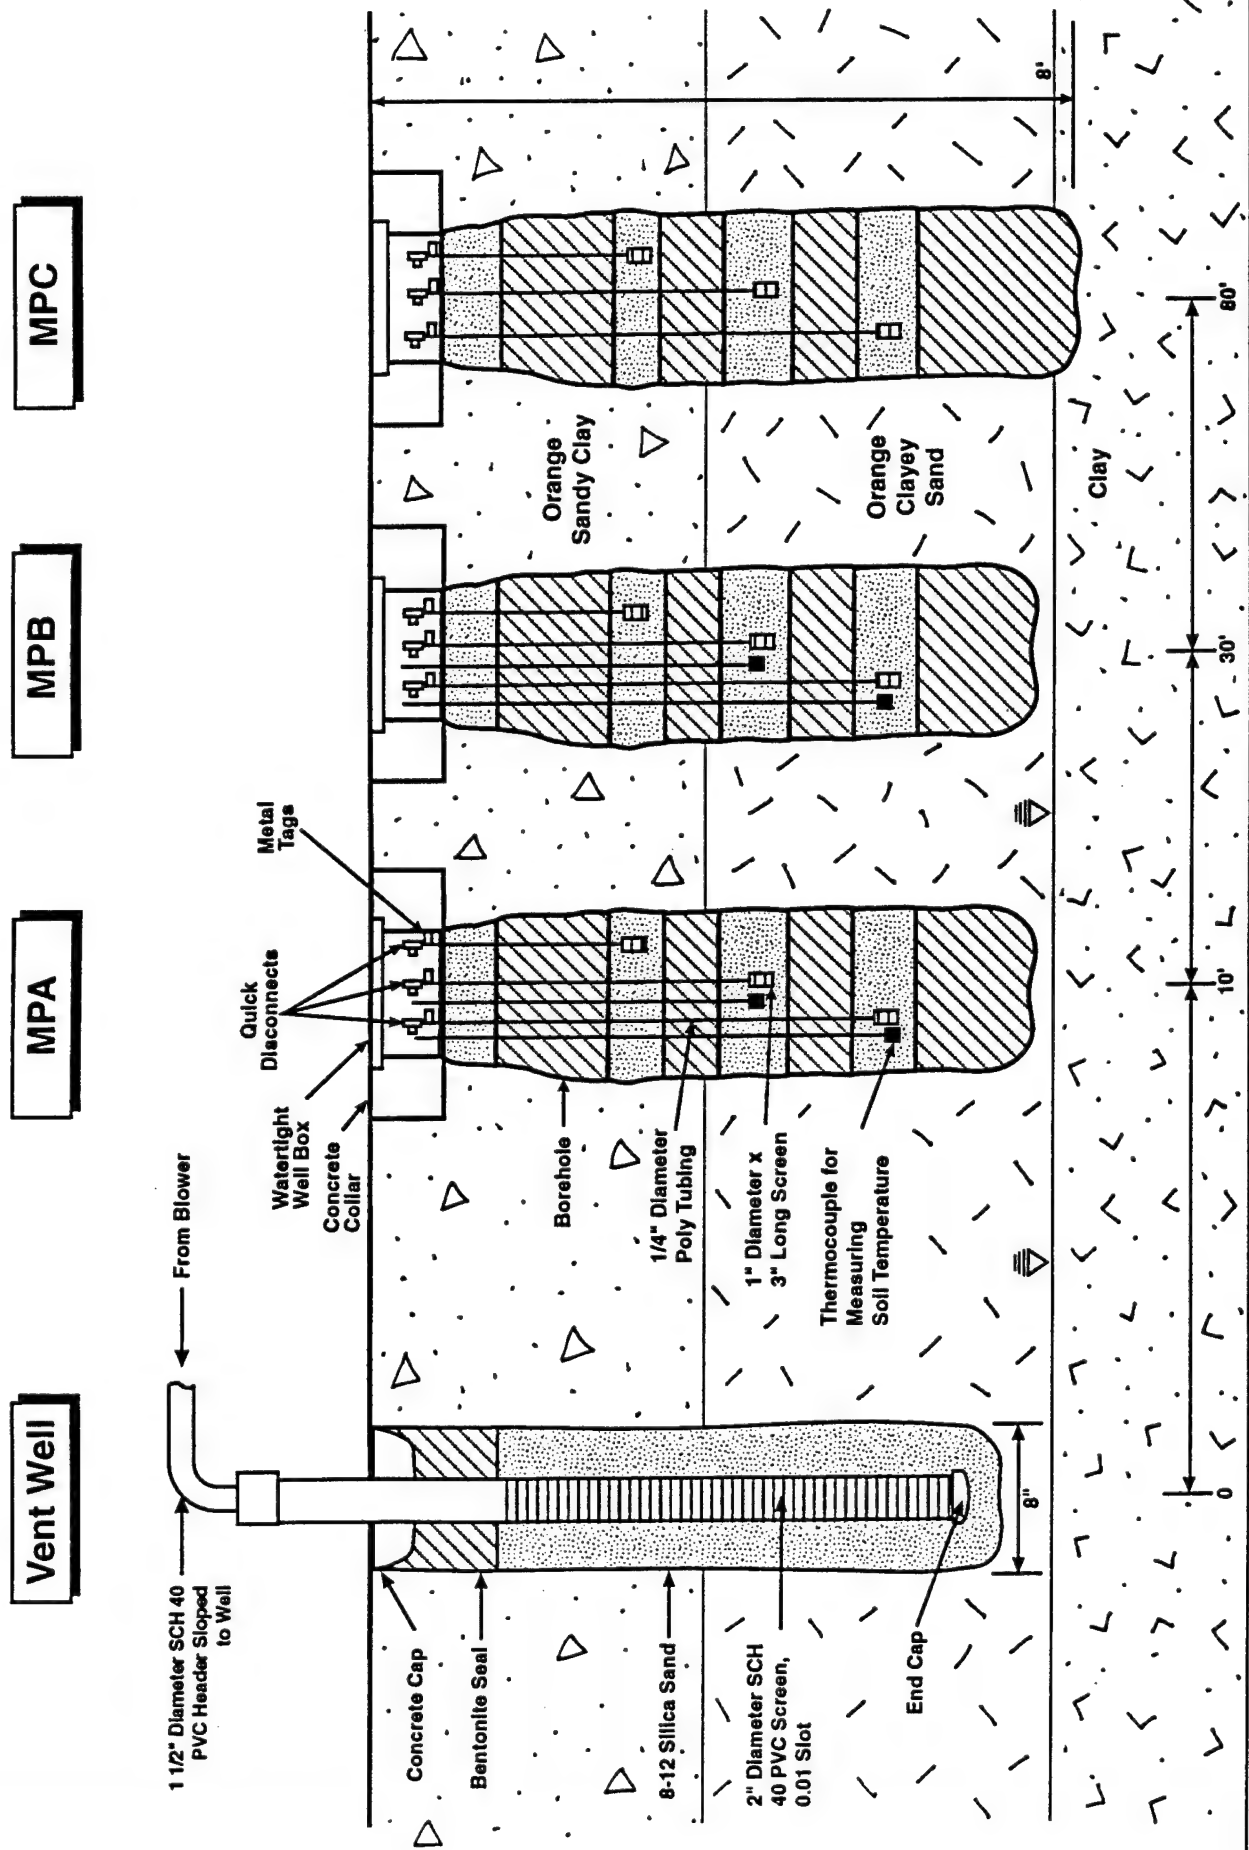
Cross Section of Vent Well and Monitoring Points at Site SS-10 Showing Site Lithology and Construction Detail (not to scale)
